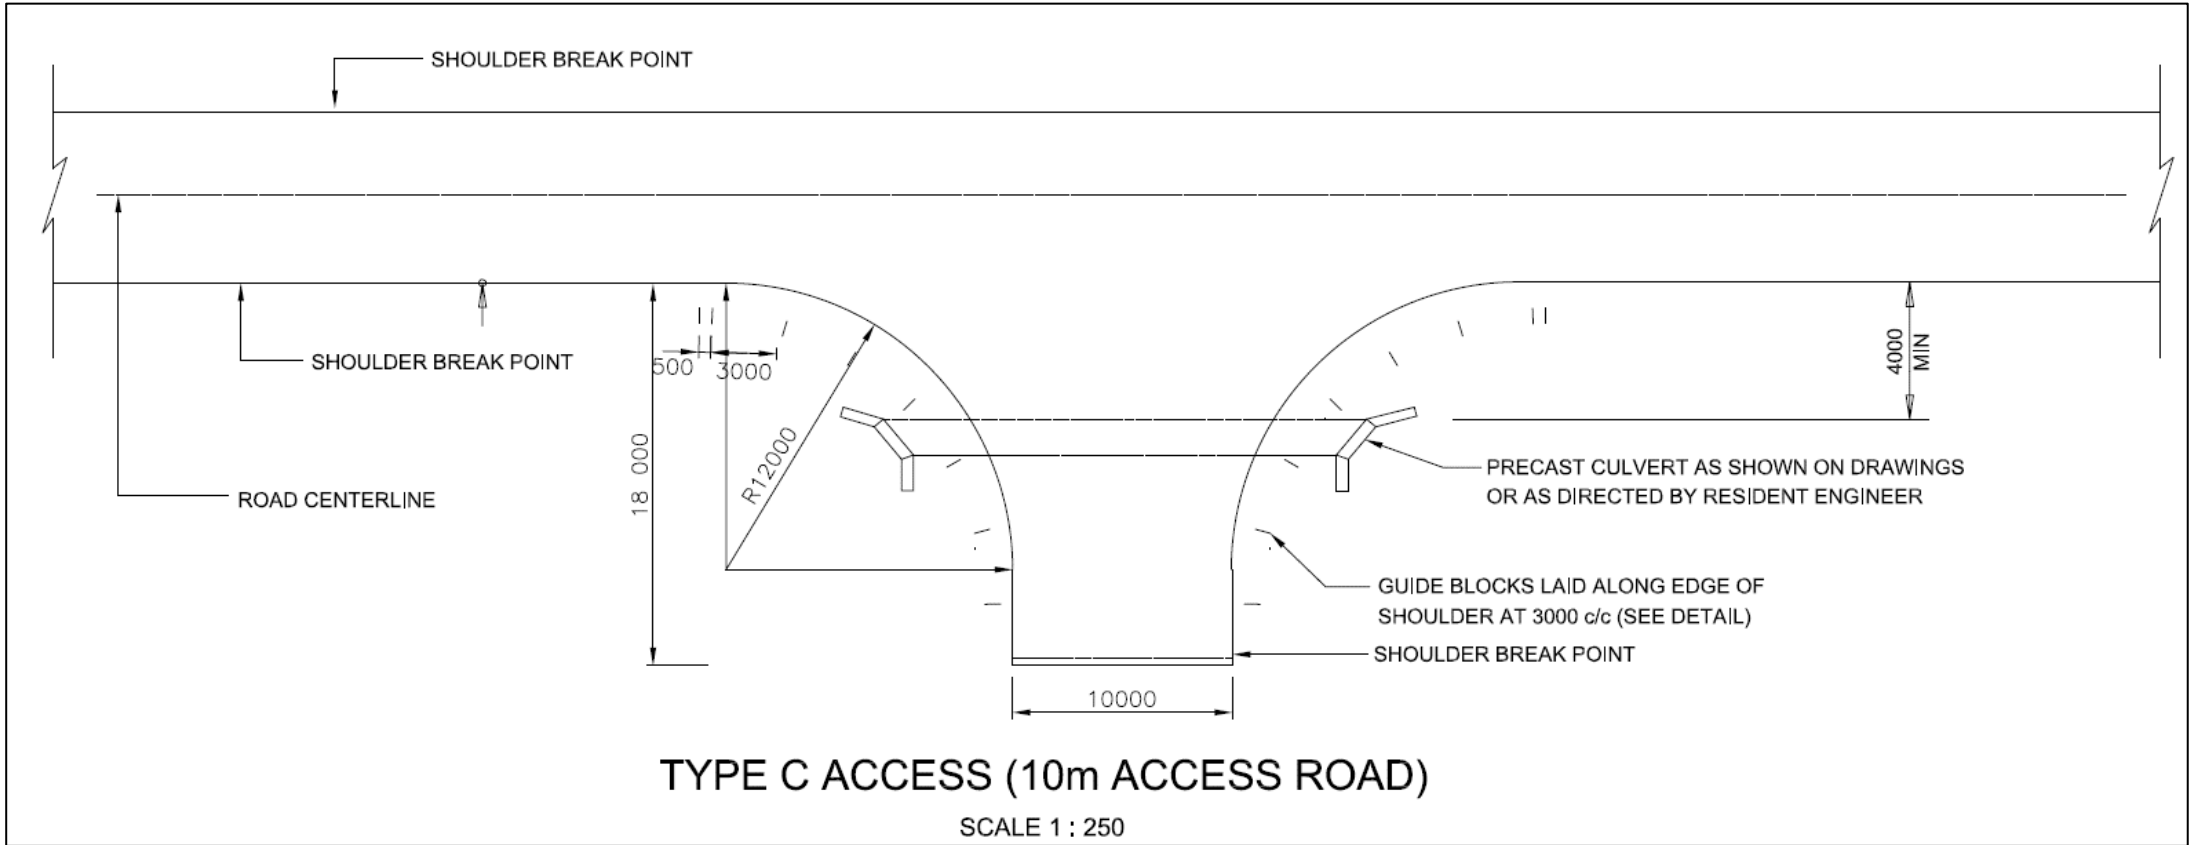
Type C access road design drilling site engineering example (Source: Preliminary Drawings by Burmeister & Partners for REN, 2022).
